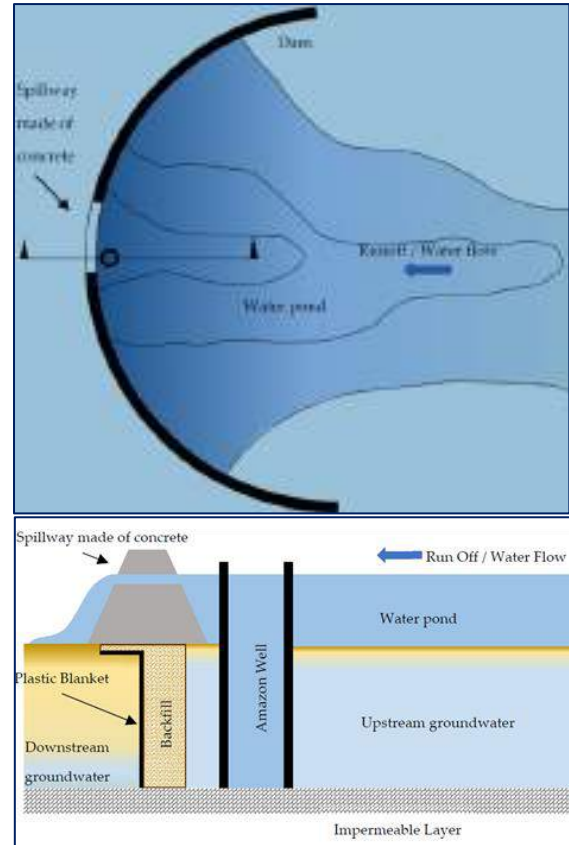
Schematic of a submersible underground dam (top: plant view, bottom; cross section) (Source: Shubo et al. 2020).
